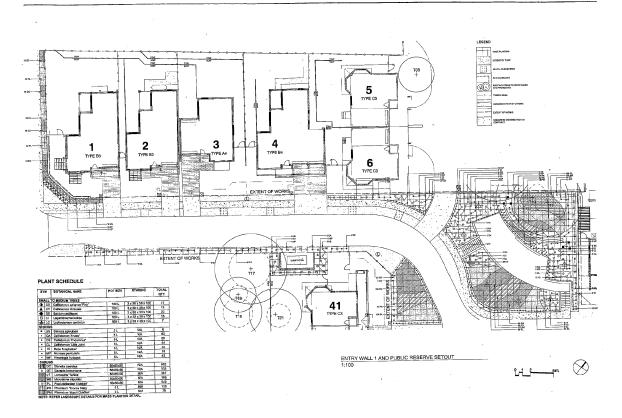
Landscape Detail Plan (Multi-Unit)
